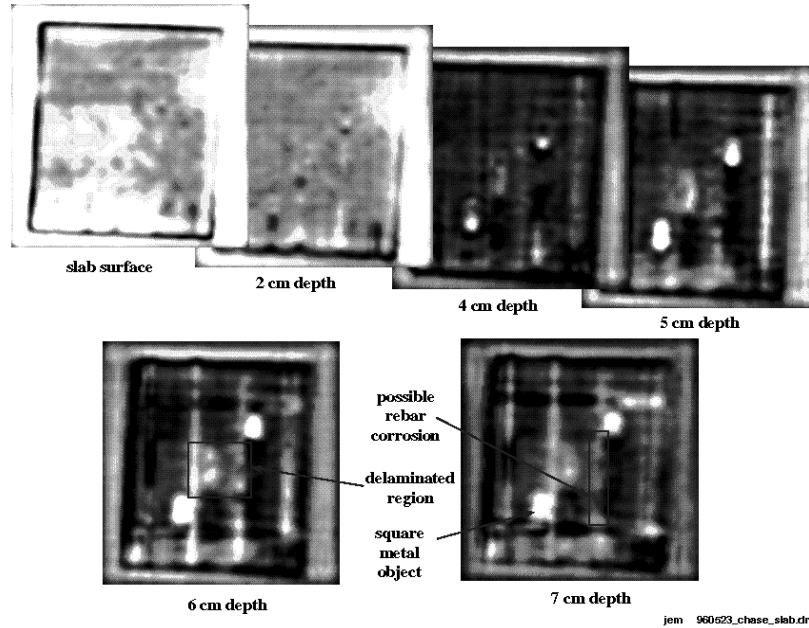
Reconstructed images of a concrete slab at various depths (see text for details).
